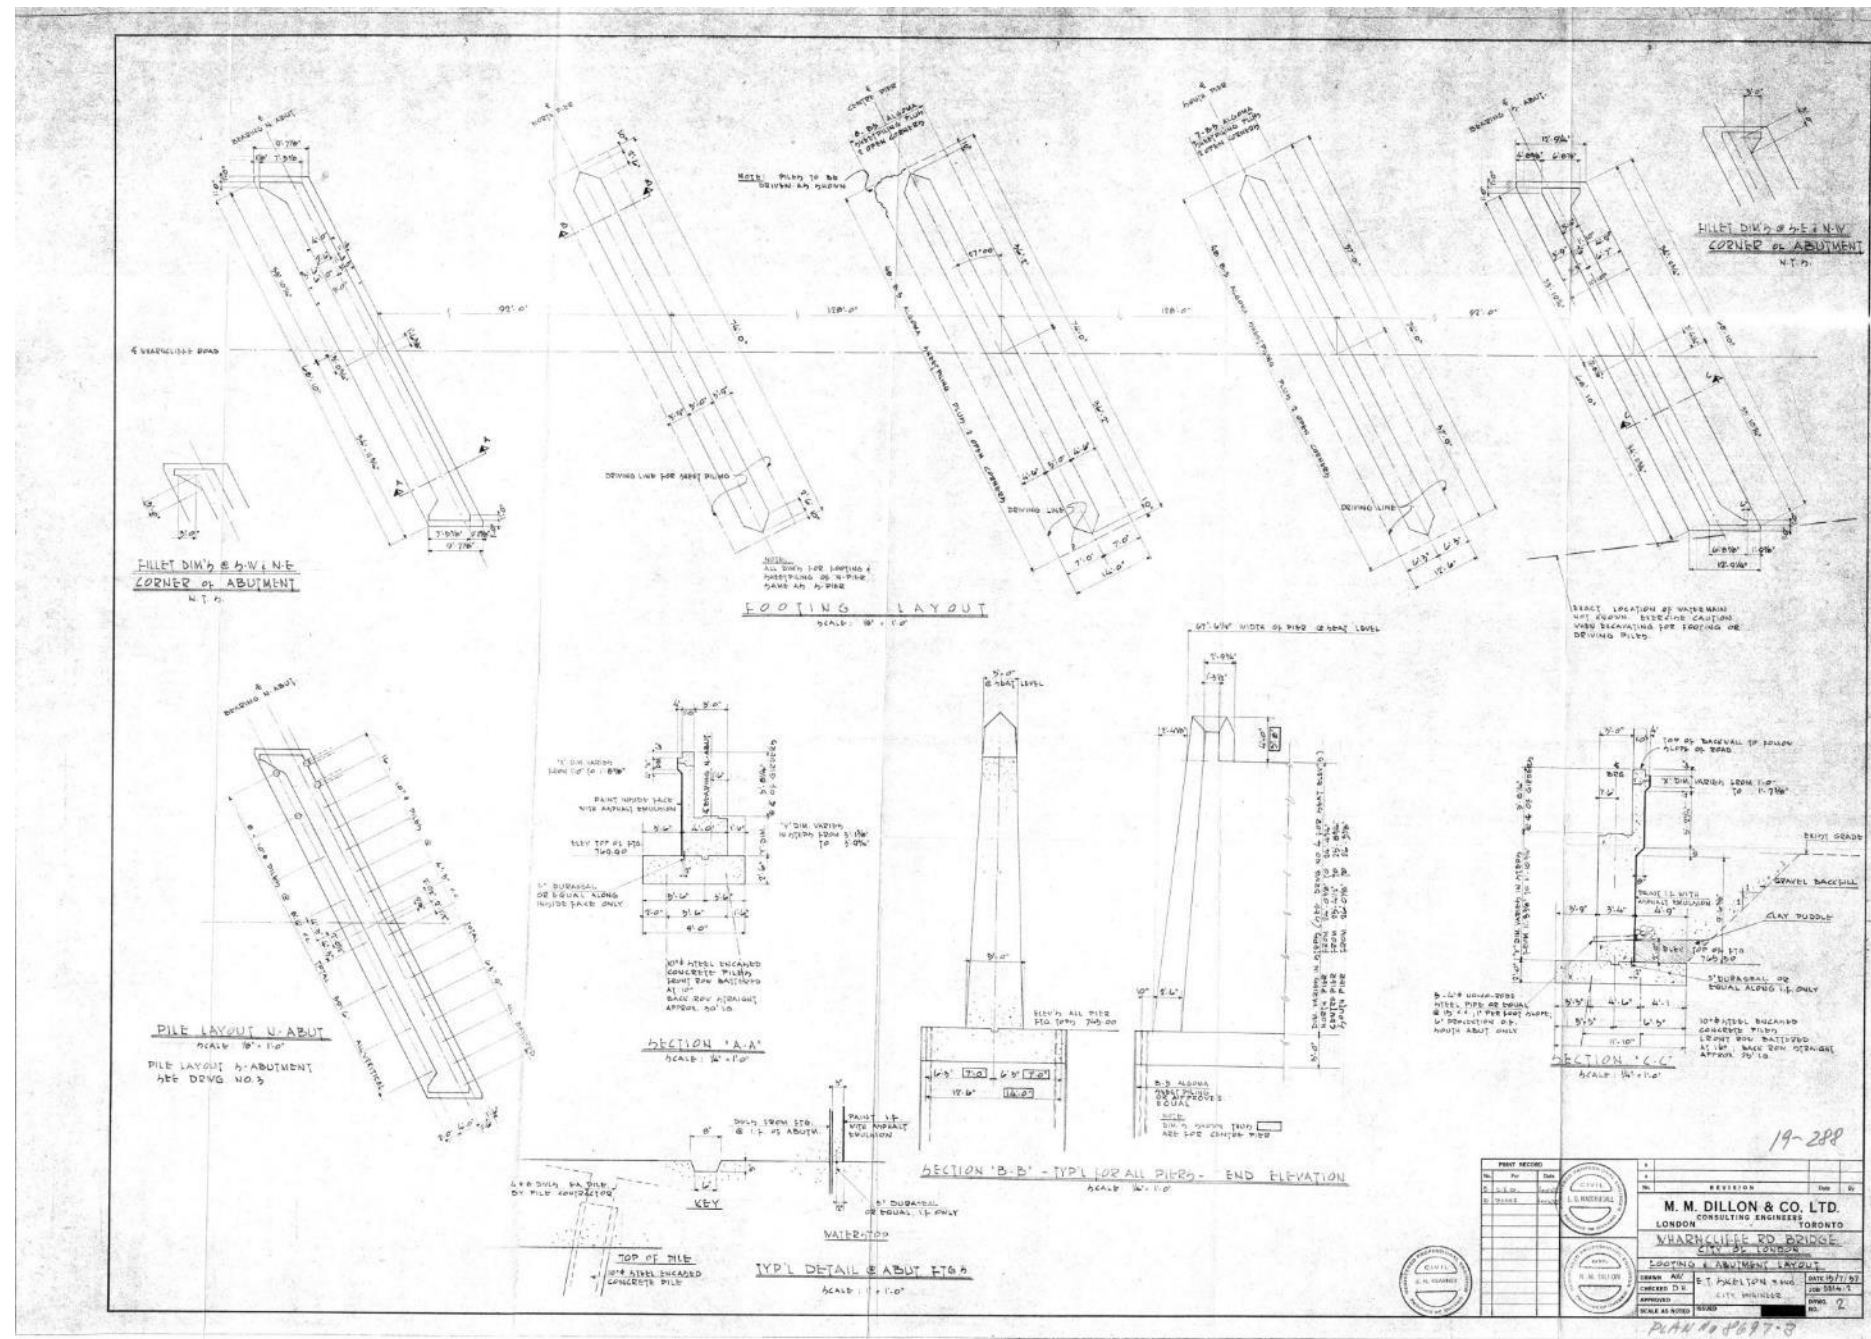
Pier Details of Wharncliffe Road Bridge, 1957
